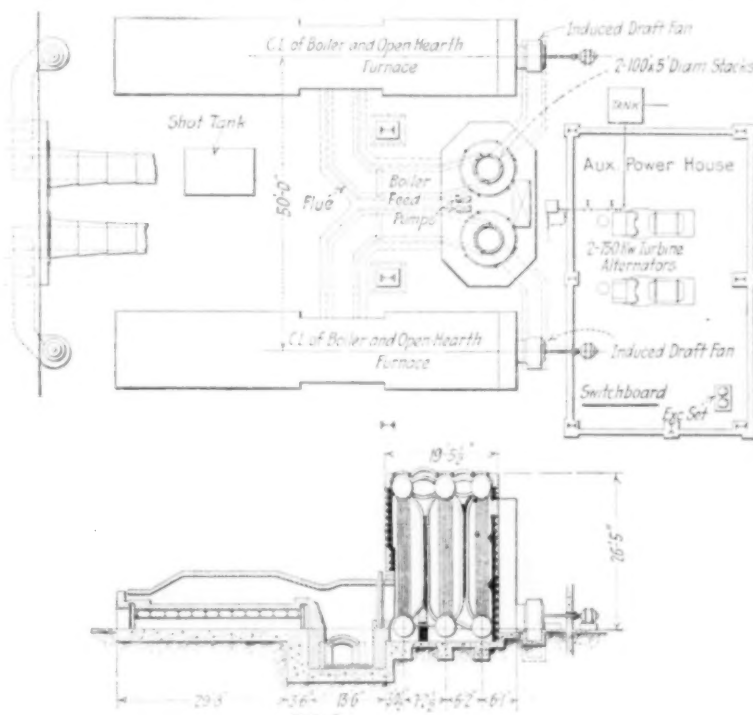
PLAN AND ELEVATION SHOWING ARRANGEMENT OF OPEN-HEARTH FURNACES WITH WASTE-HEAT BOILERS AND AUXILIARY POWER PLANT
